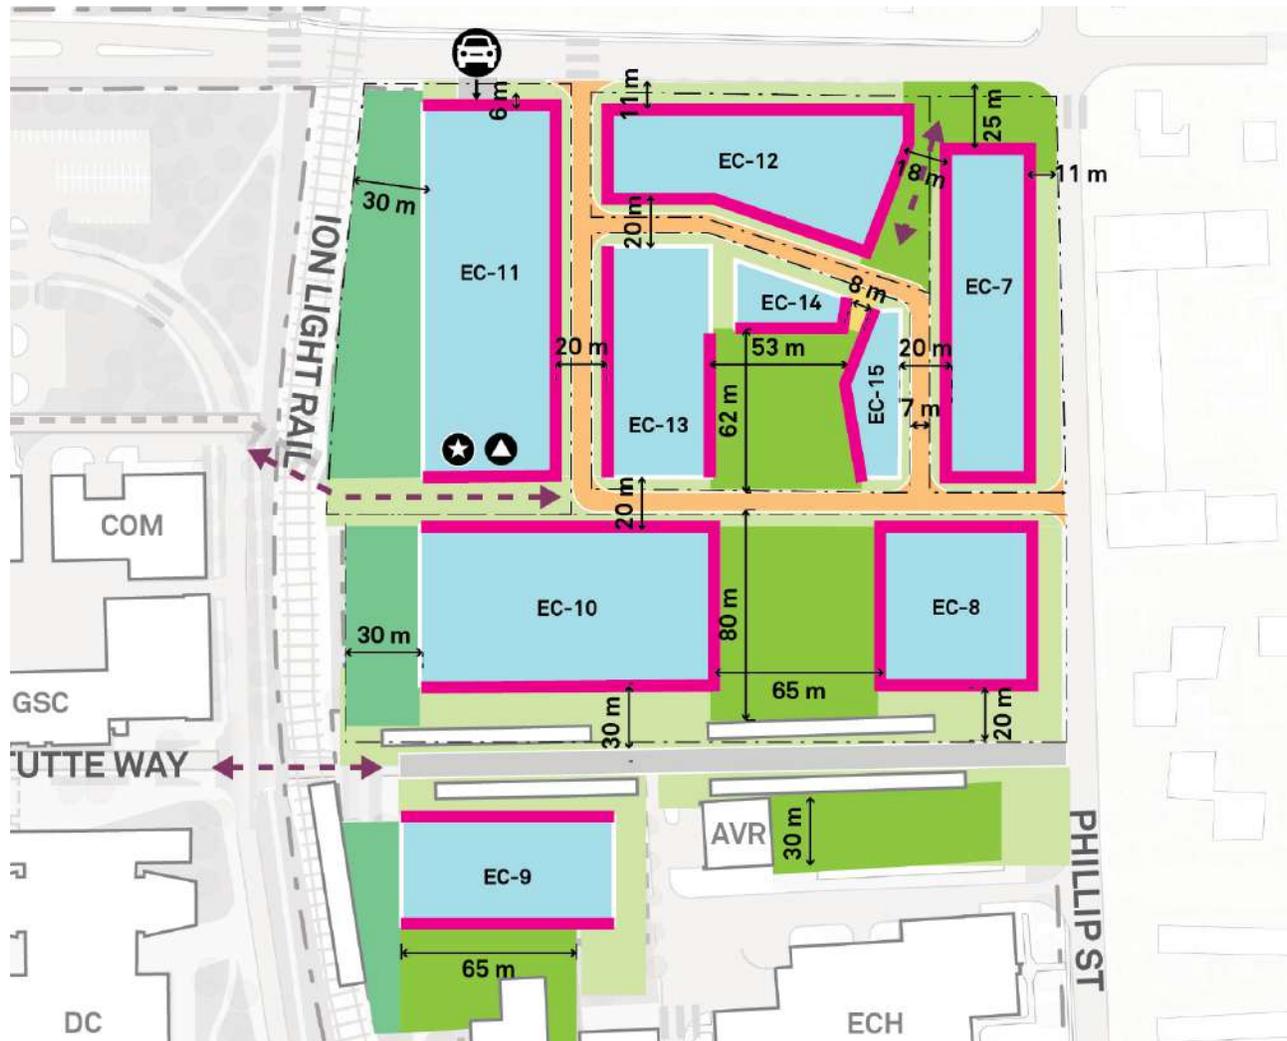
East Village Site Opportunities Plan. Highlighting key site plan, setbacks, open space and building development opportunities.
